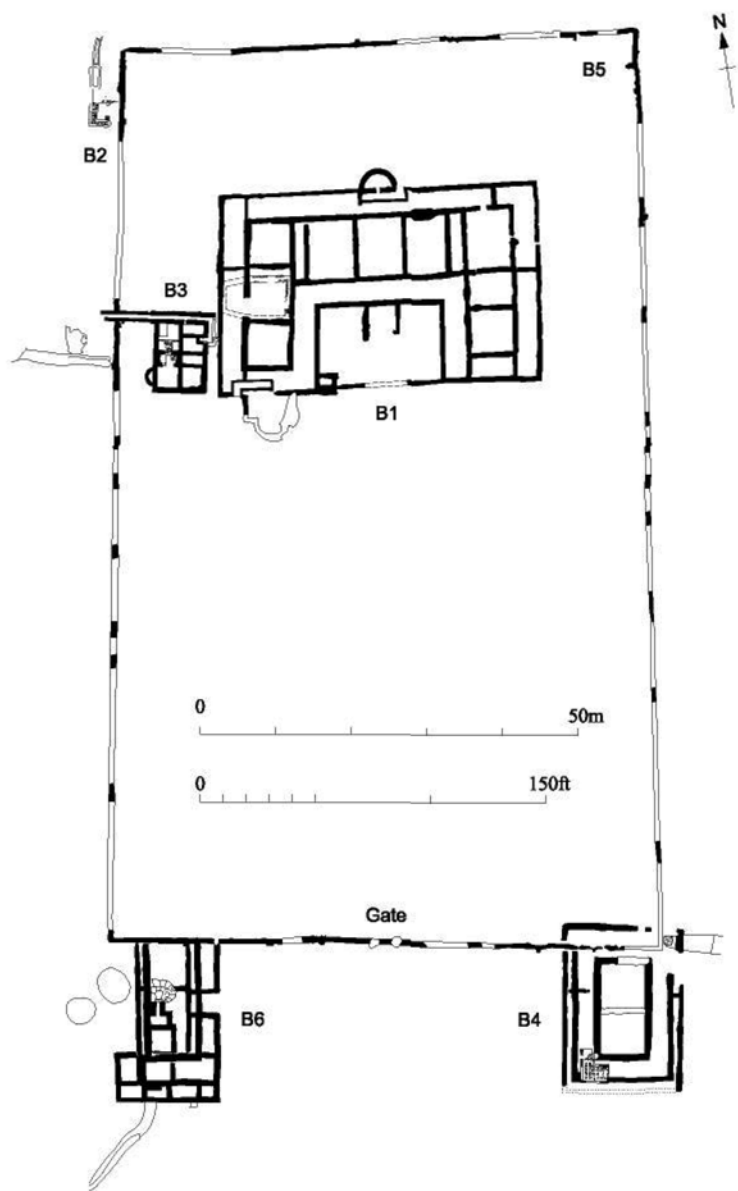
General plan of the villa complex showing the position of the main house (Building 1) in relation to other buildings and structures.
